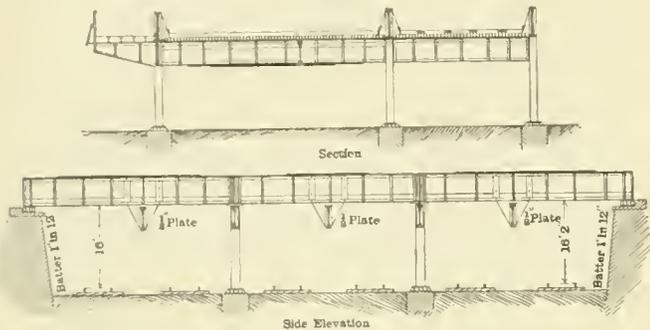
SIDE VIEW AND SECTION OF CLARK STREET VIADUCT.
